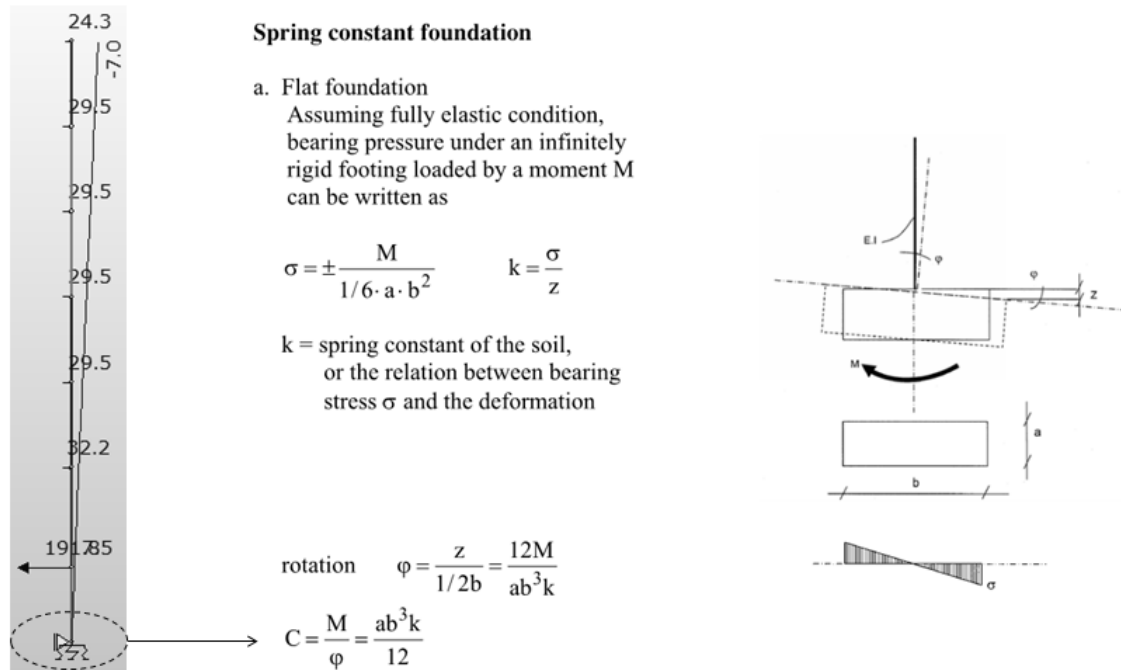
(Left) Basic structural schematization stability walls and core (Right) Spring constant foundation
